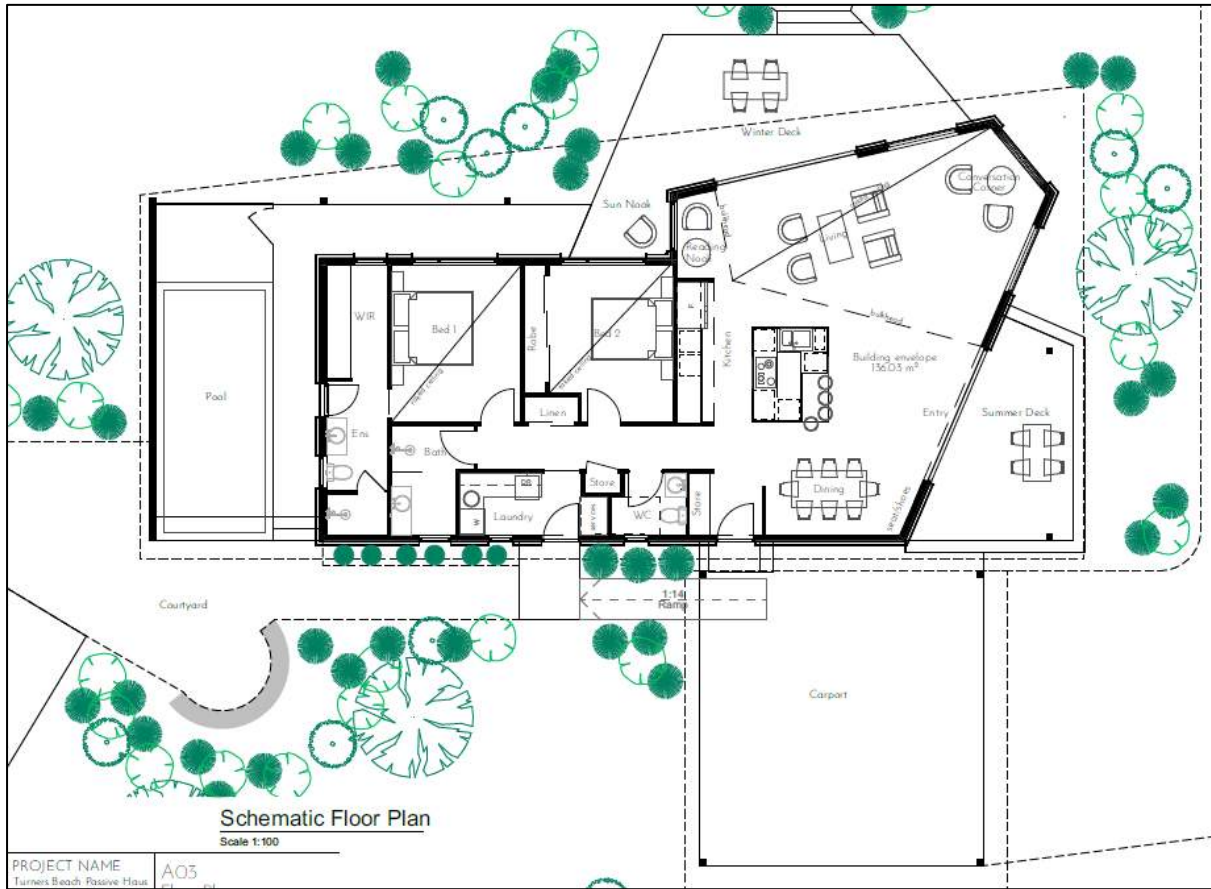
Schematic floor plan of dwelling (Source: Spectura Studio).
